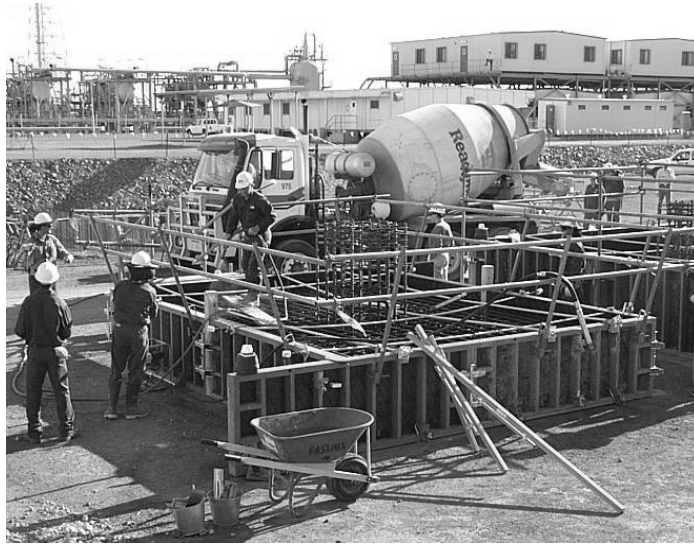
Foundation Construction Access and Barriers – Woodside LNG Train 4
